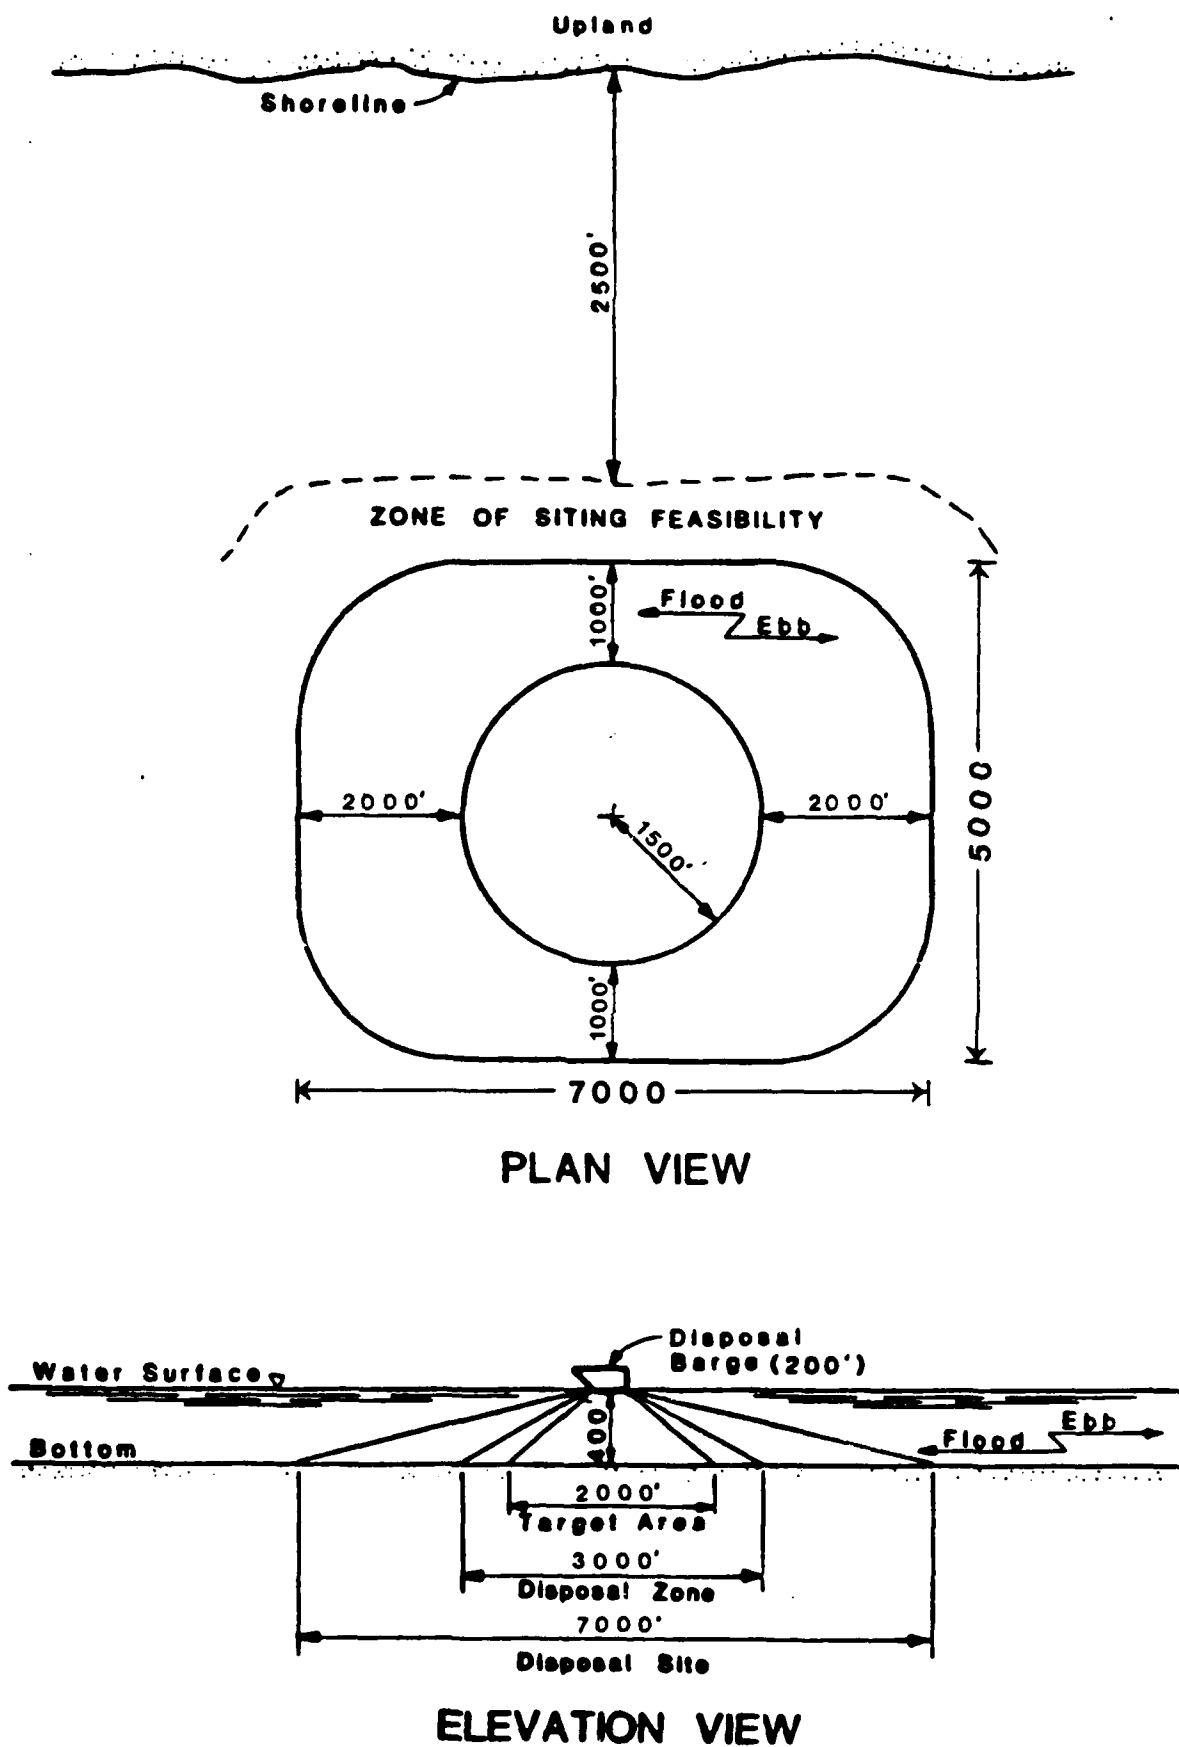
Typical disposal site dimensions for a dispersive area
